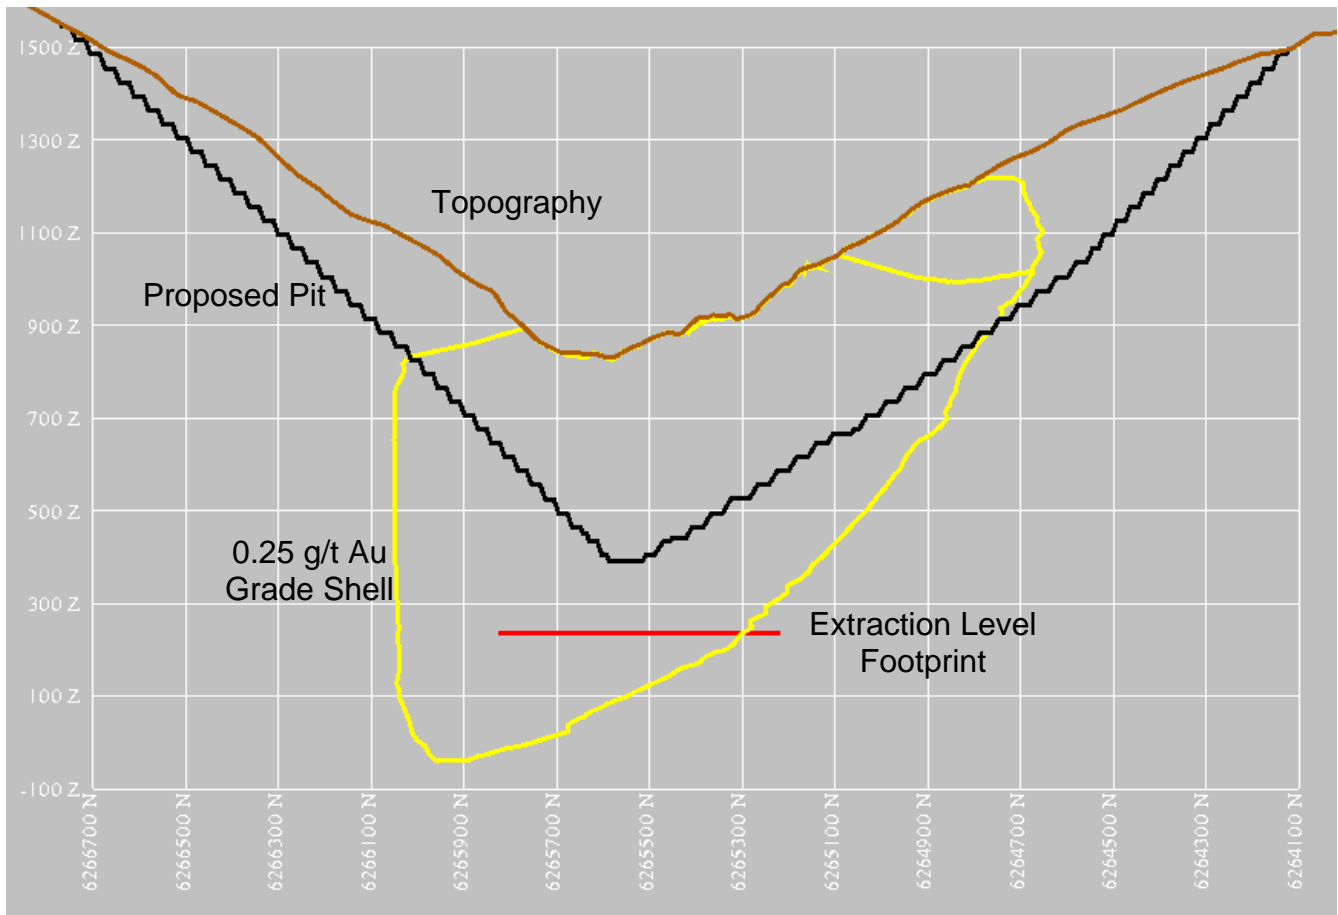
Vertical cross-section (423100 Easting) showing topography, proposed pit, 0.25 g/t Au grade shell and block cave extraction level footprint
